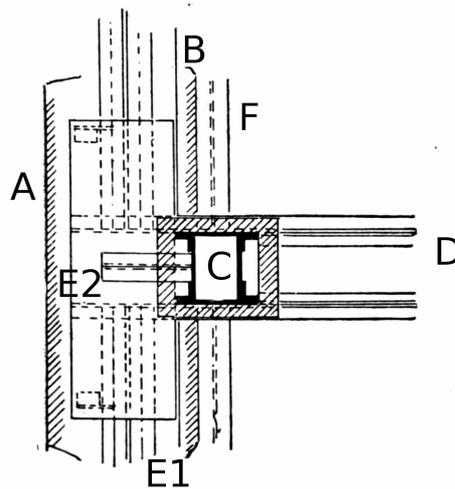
Exterior wall plan section of the St. Paul Building, showing the exterior (A) and interior (B) faces of the exterior wall, the spandrel column (C), an interior girder (D), the wall-carrying double spandrel beam (E1), the bracket to carry the spandrel beams (E2), and the frame spandrel (F); (Birkmire 1906, p. 190)
